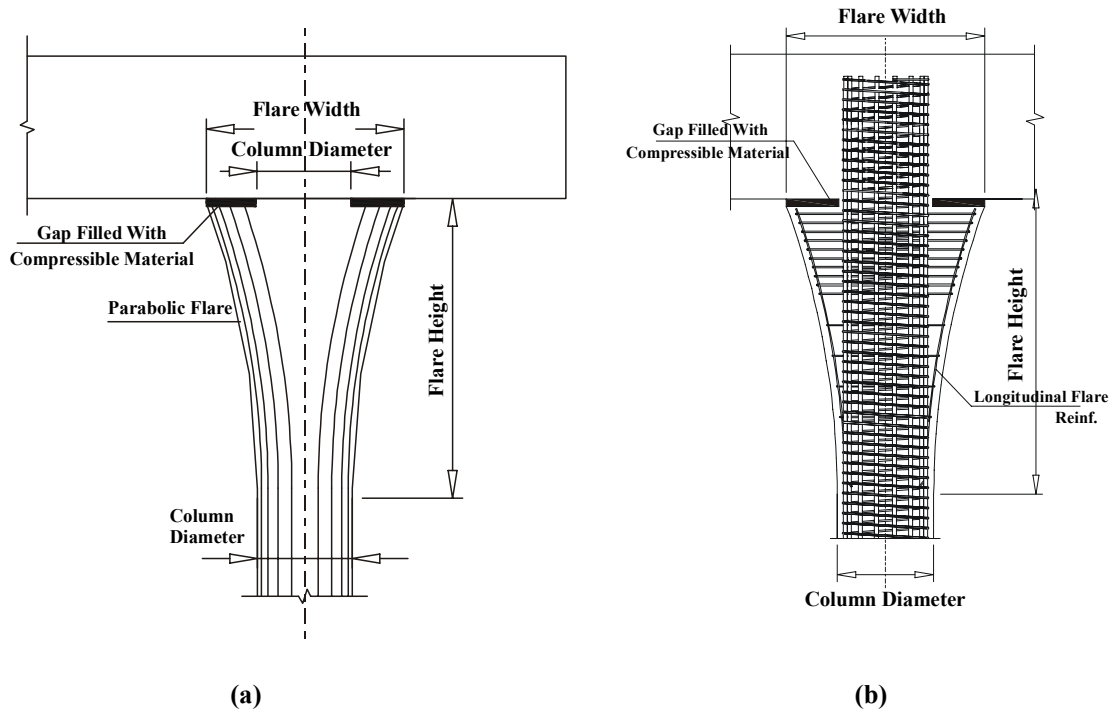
Caltrans Gap Specifications (a) Proposed Detail Layout (b) Reinforcement Detail
